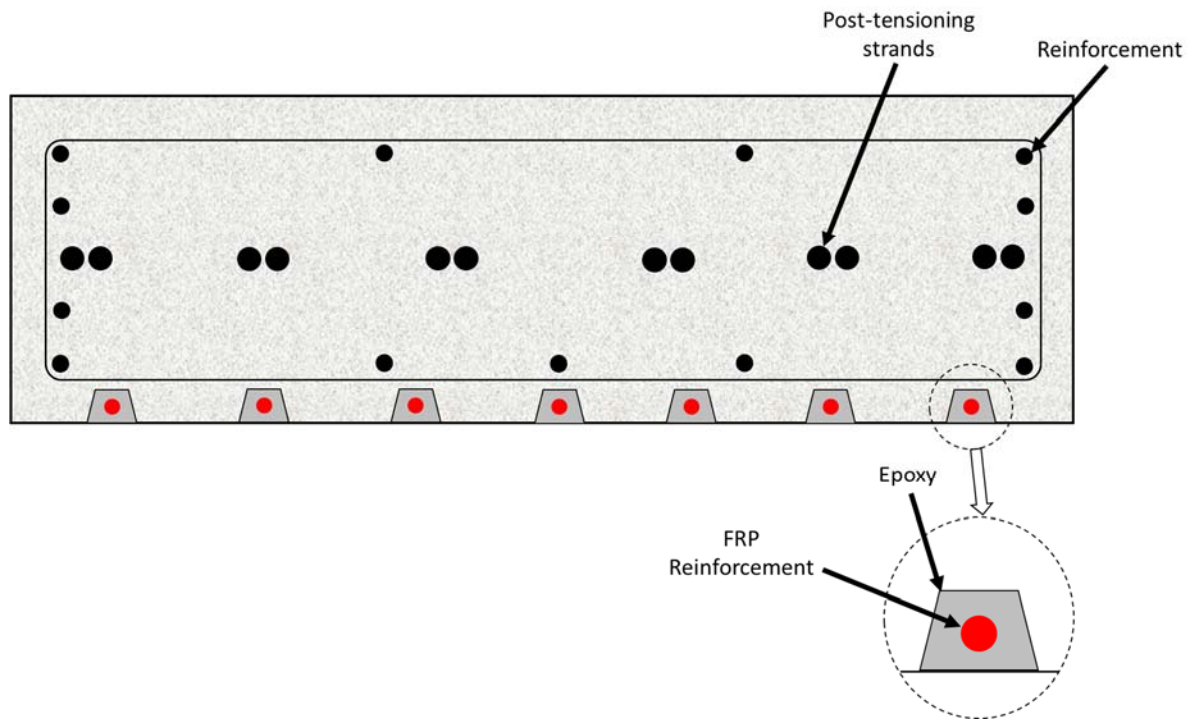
Post-tensioned concrete slab strengthened with NS-FRP.
